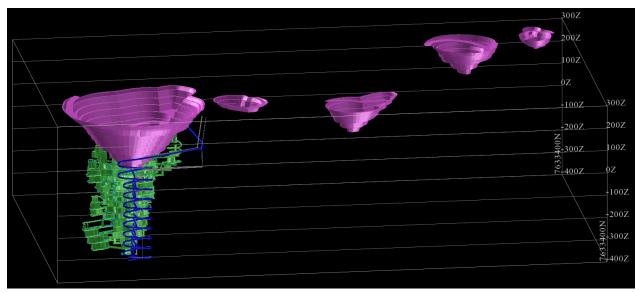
Minyari Dome Project conceptual open pit and underground mine design (view bearing -16° to 098°)
